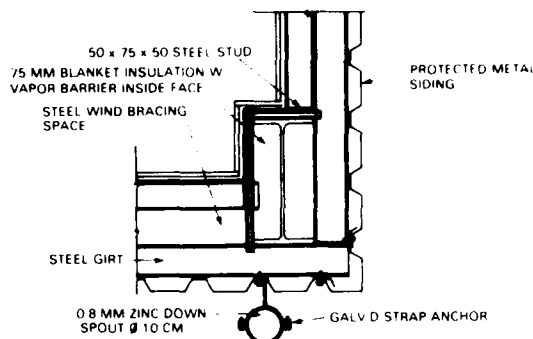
Detail showing metal panel exterior fastened with sheet metal screws—building corner interconnection (typical).
